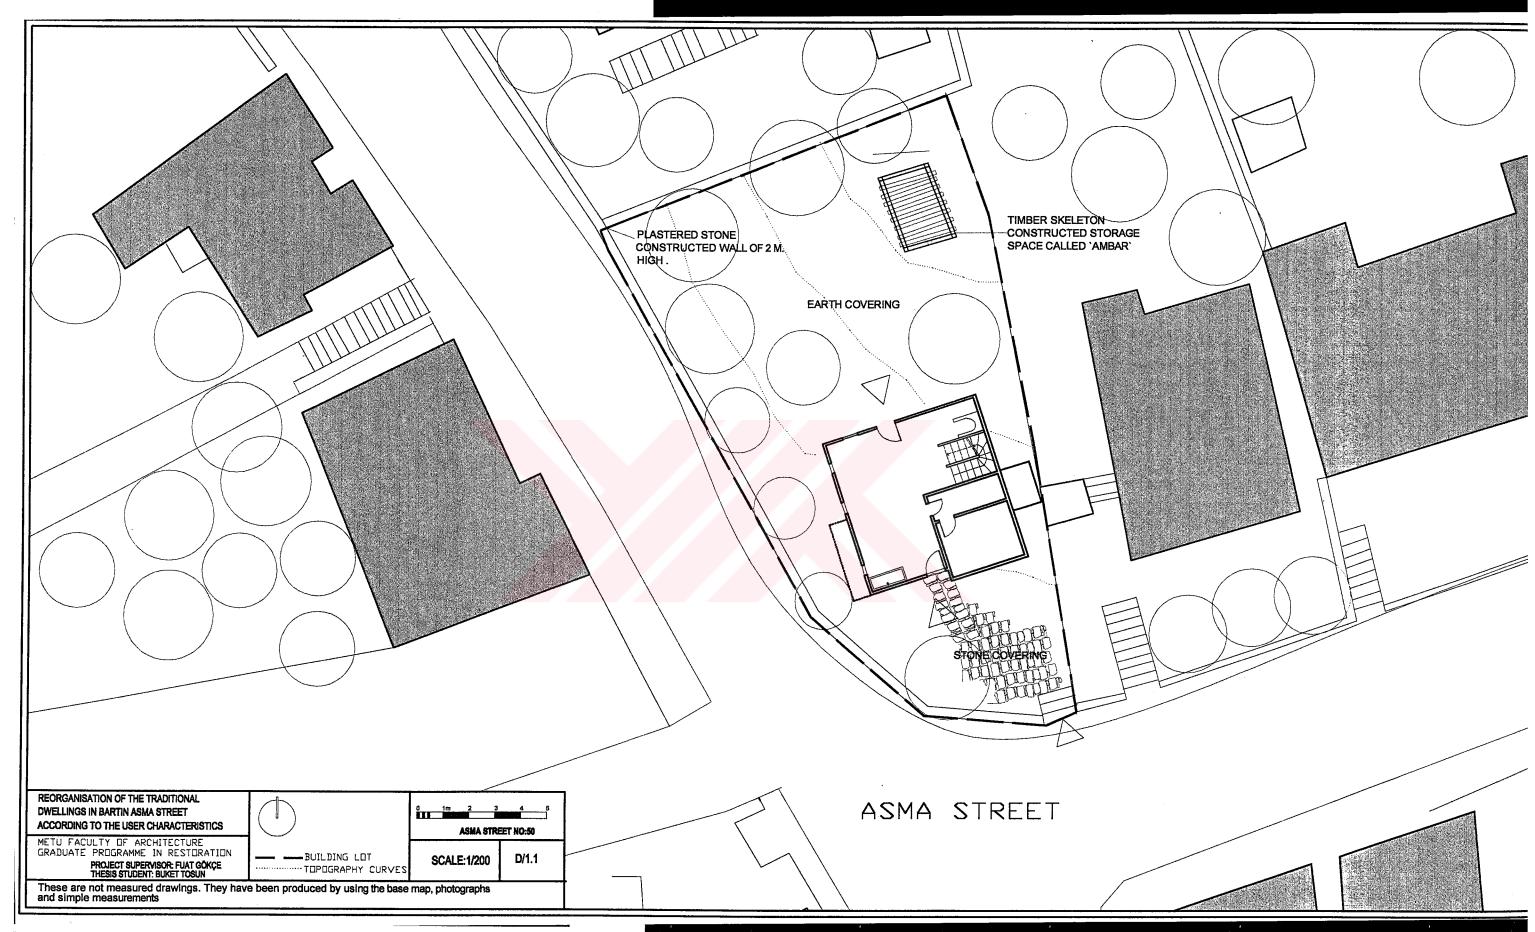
Sketch Drawings of the Building Lot of The Building No:50
